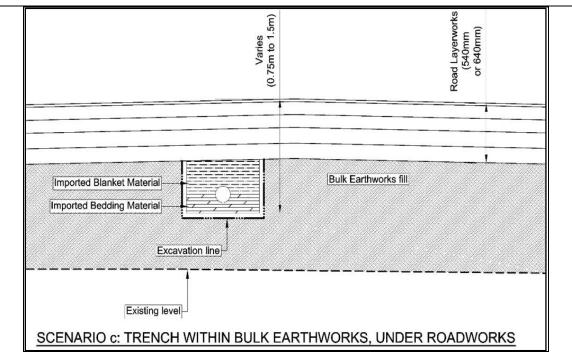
SCENARIO C: SERVICES- TRENCH WITHIN Bulk Earthworks (under roadworks) (SOURCE: WALTERS, 2020)
